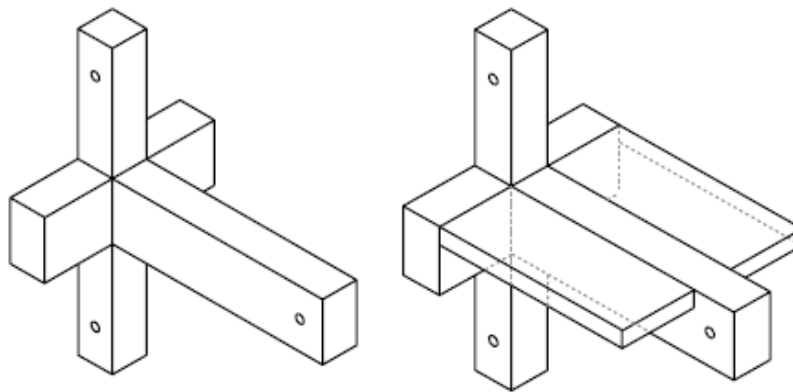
Exterior specimens with and without slab, Gogkoz [50]
